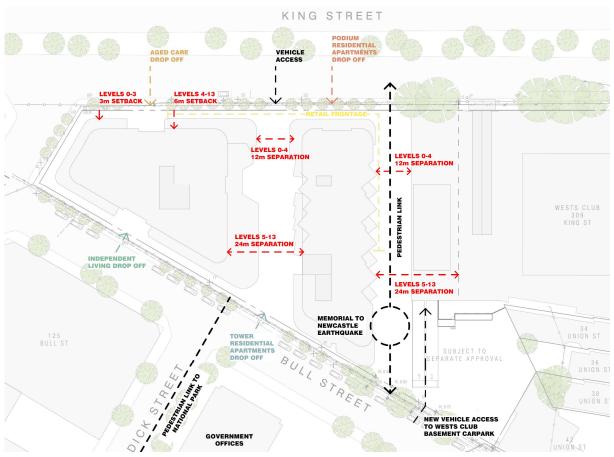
Extract of Urban Planning plan (DA032 at Appendix 2)
